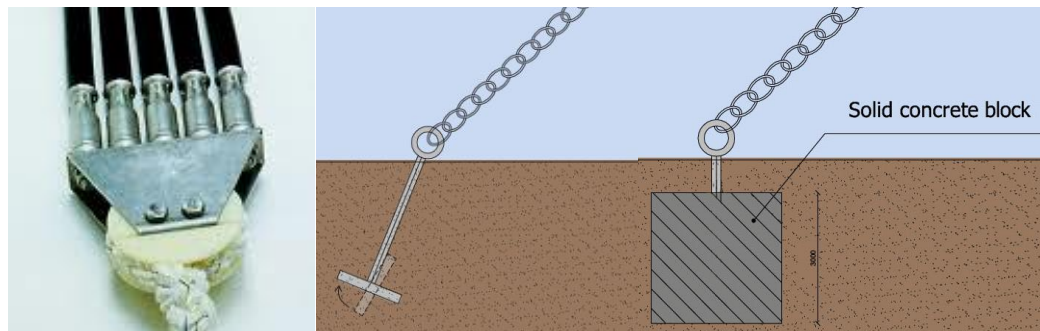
Examples of mooring/anchor systems (Flexible system –left); folded anchor with chain (middle figure); Concrete heavy block with chain (right figure).
